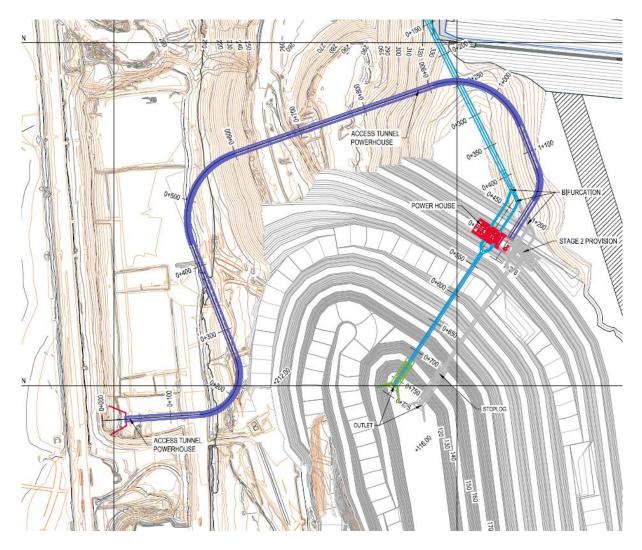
Main Access Tunnel (MAT) to Underground Powerhouse
